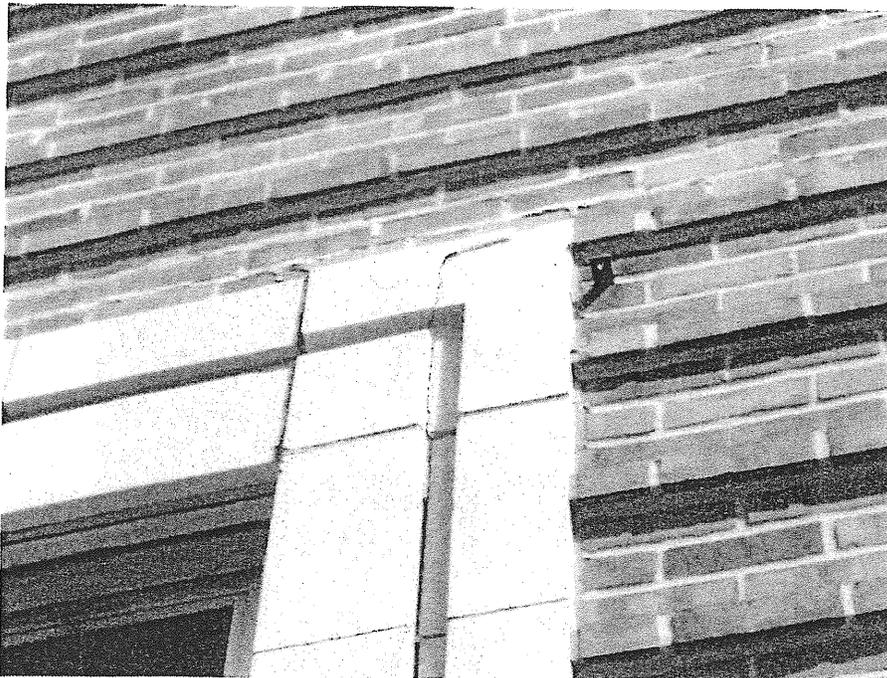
Detail of terra cotta surround at store front. Note cracks in upper block.
